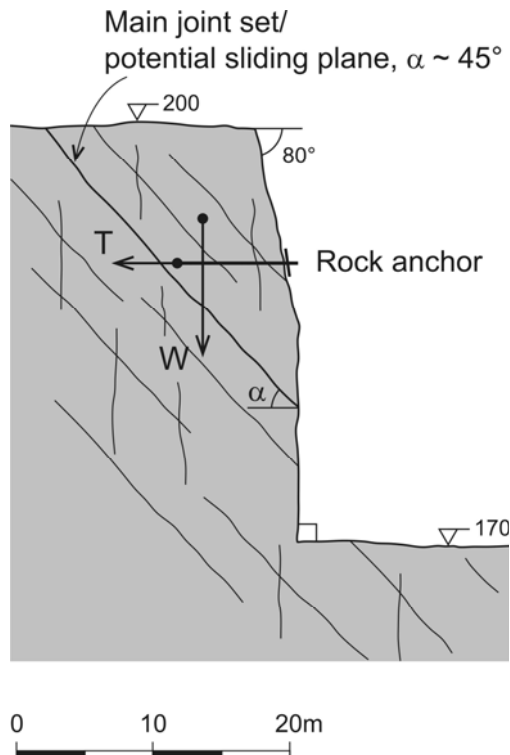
Principle sketch of bench stability problem due to undercutting joints in the hanging wall.
